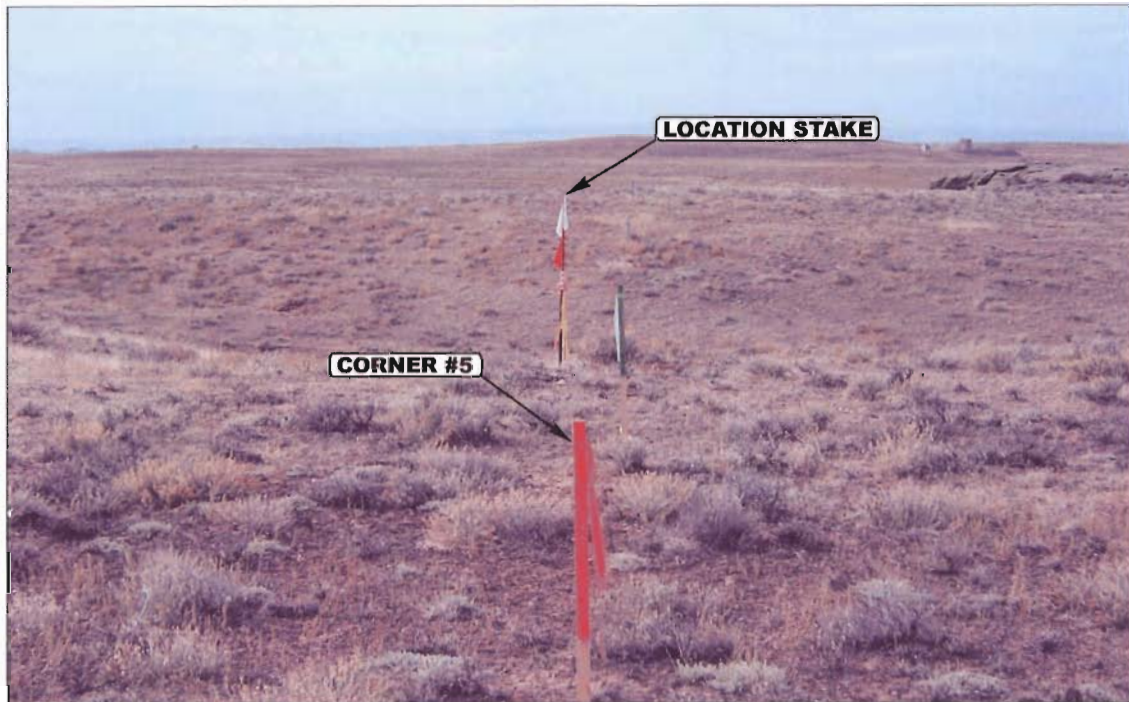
PHOTO: VIEW FROM CORNER #5 TO LOCATION STAKE
